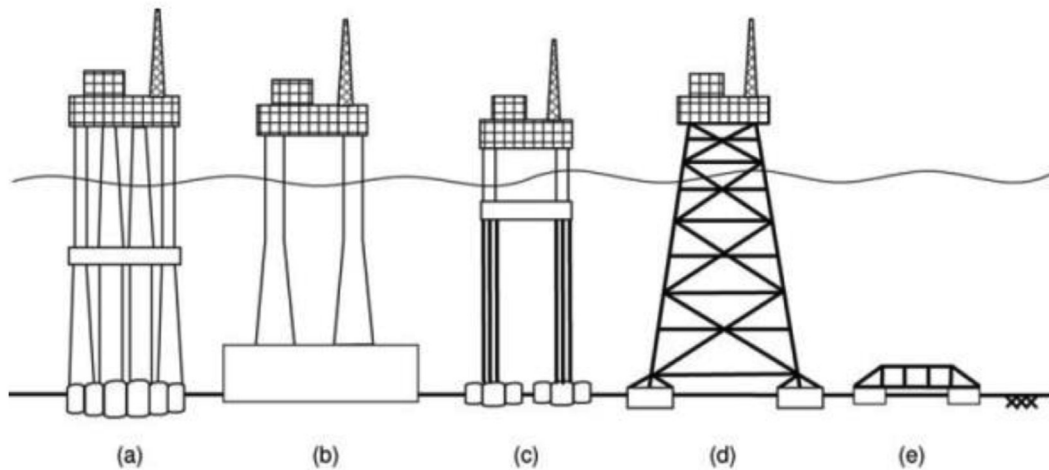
Applications of offshore shallow foundations: (a) Condeep gravity-based structure (GBS); (b) GBS; (c) Tension-leg platform (TLP); (d) Jacket; (e) Subsea frame [6].
